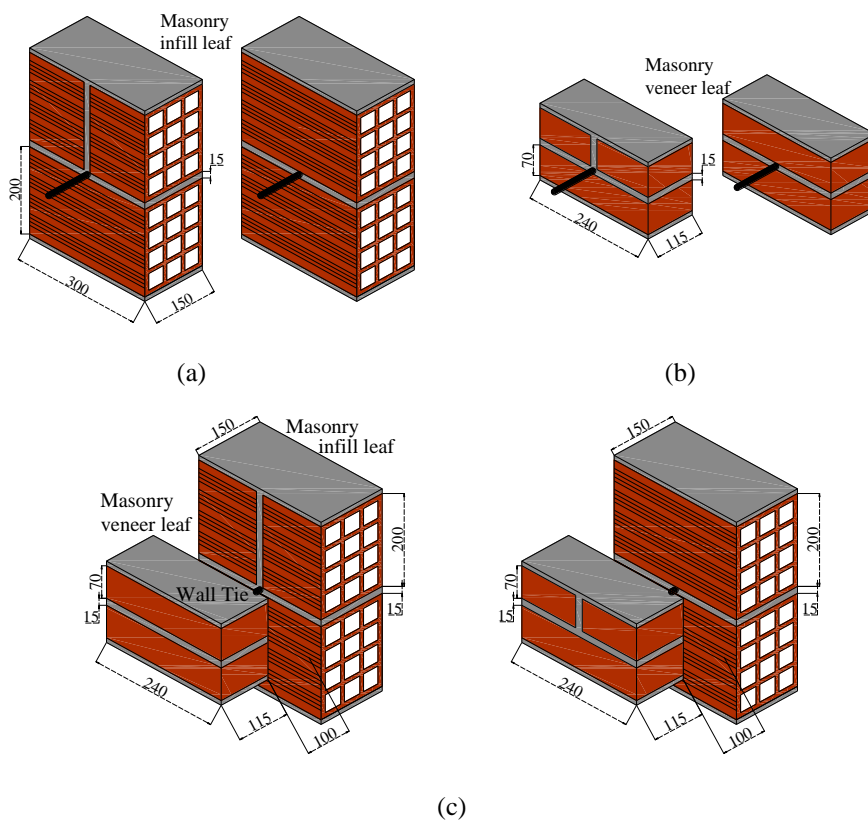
Representative schemes of specimens: (a) brick masonry infill with embedded tie; (b) brick masonry veneer with embedded tie; (c) complete assemblages of brick masonry prisms connected (infill and veneer) through ties
